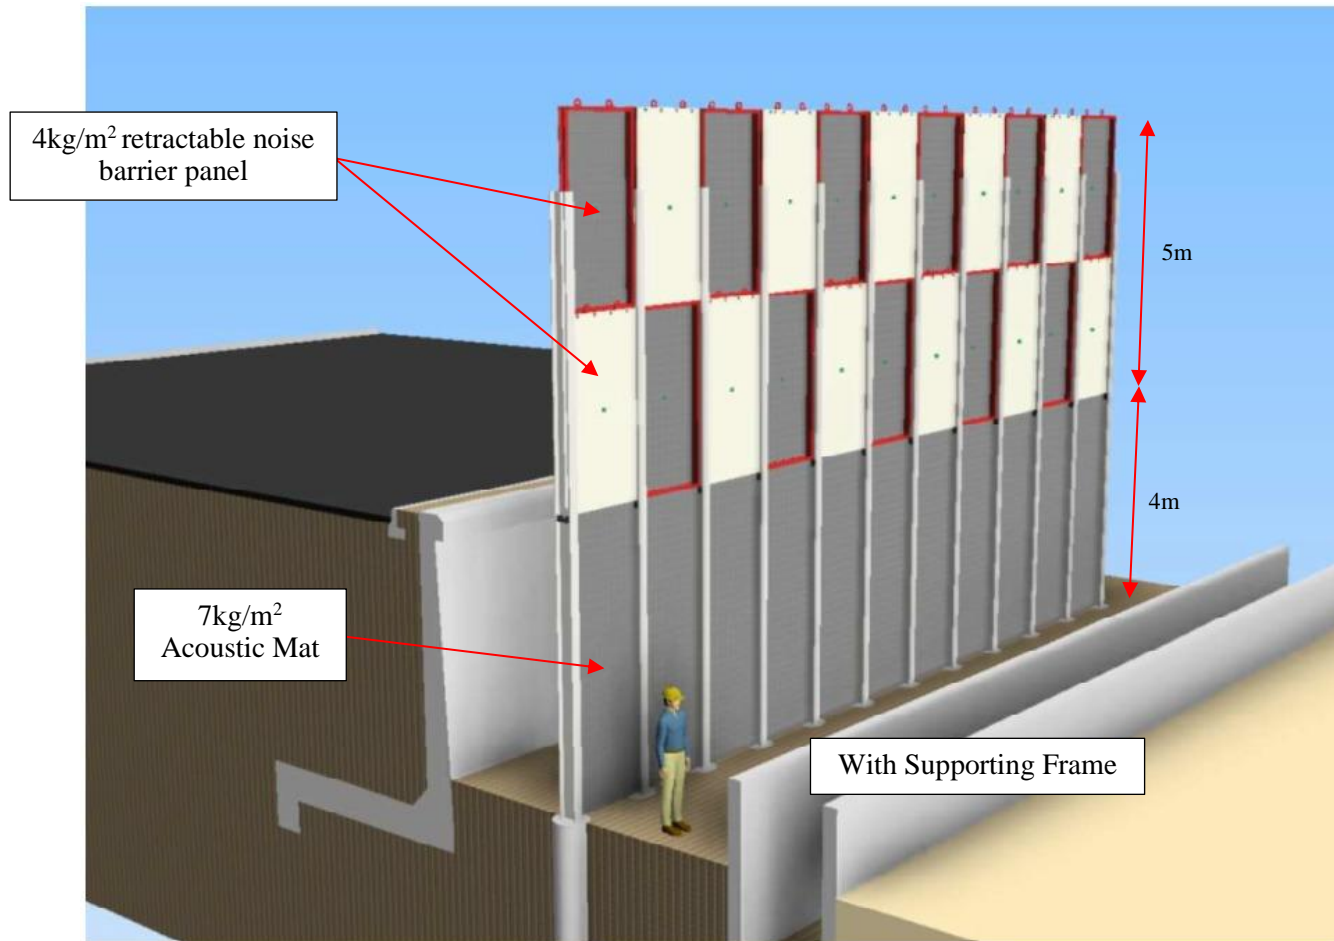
Noise Barrier Schematic for D-wall Construction
